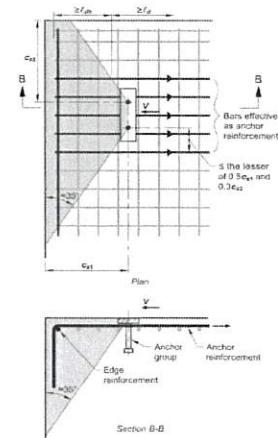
(b)—Edge reinforcement and anchor reinforcement for shear
